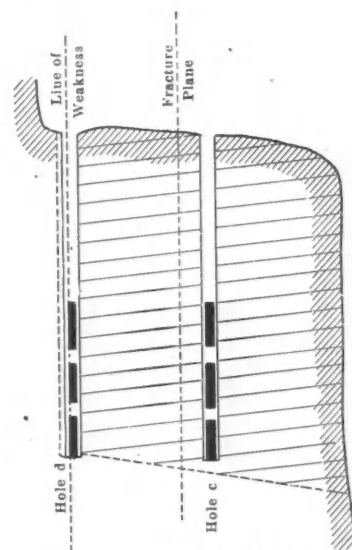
HOLES DRILLED PARALLEL TO LINE OF FRACTURE GIVE BEST RESULTS
